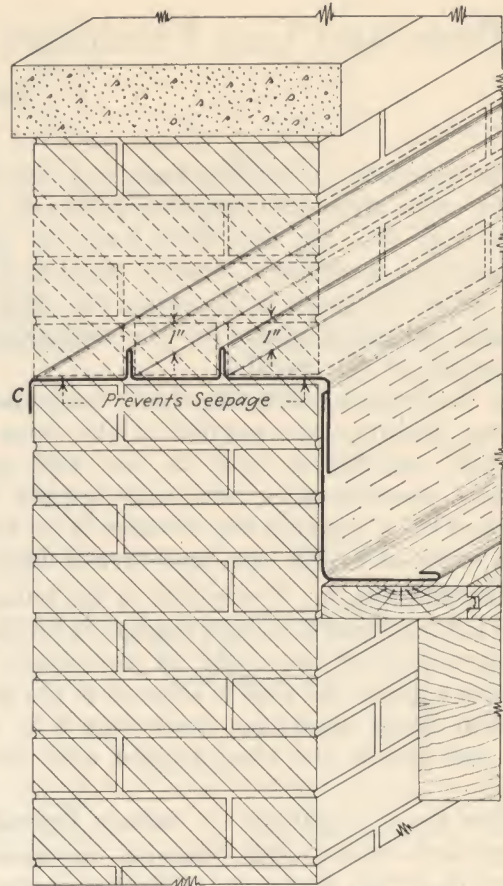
CAP FLASHING COVERING ENTIRE WALL
